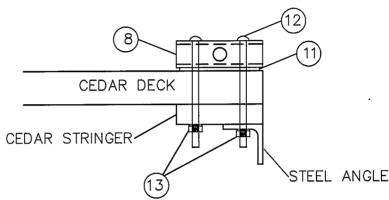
Fig. B STEEL TRUSS STYLE FRAME SHOWN
